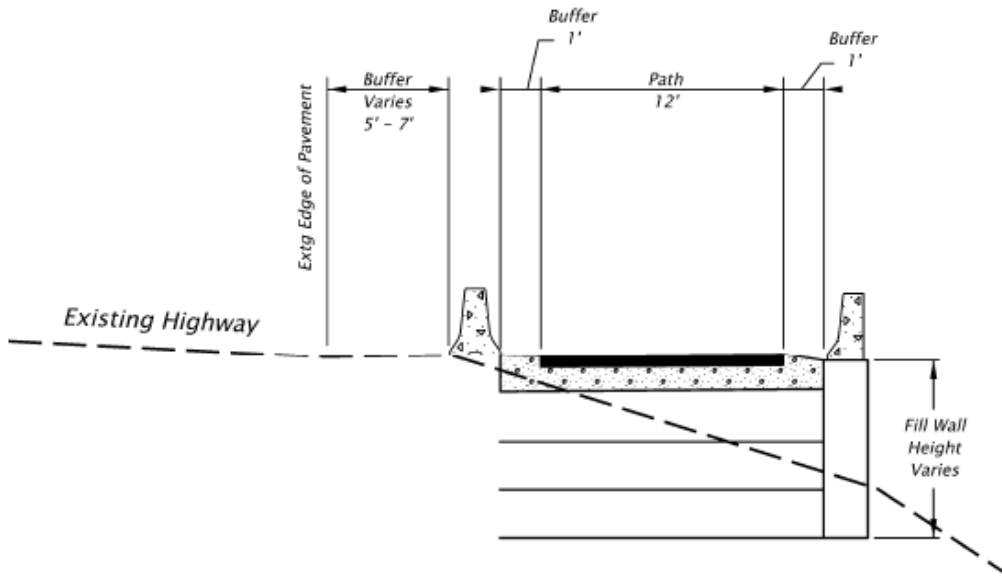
Alternative C2 Retaining Walls Typical Cross Section
